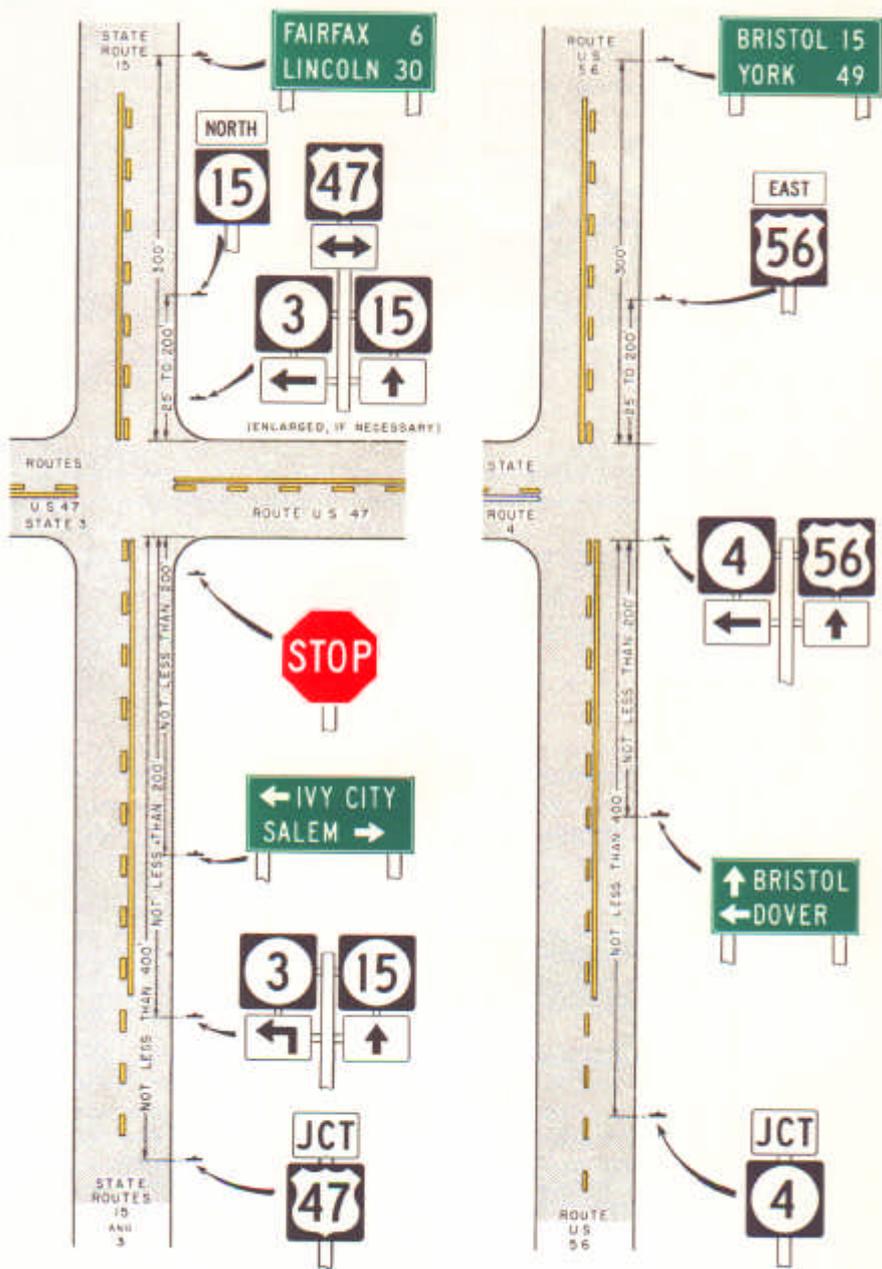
Typical route markings at rural intersections (for one direction of travel only).
